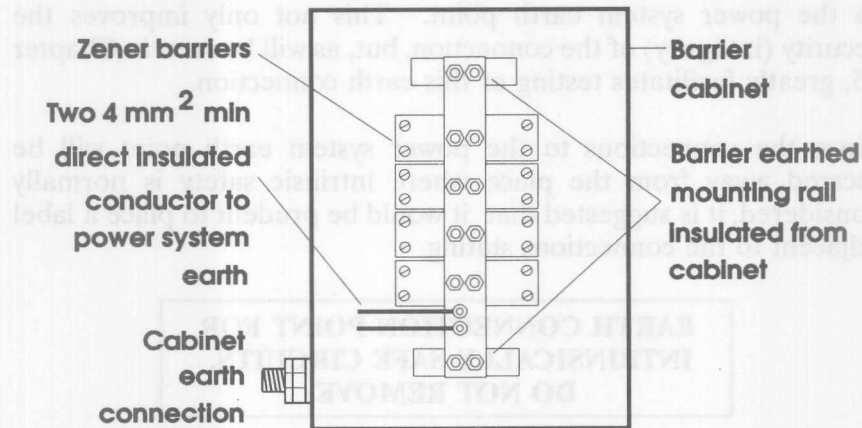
Installation and Earth Connection for Zener Barriers in the Non-Hazardous Area
